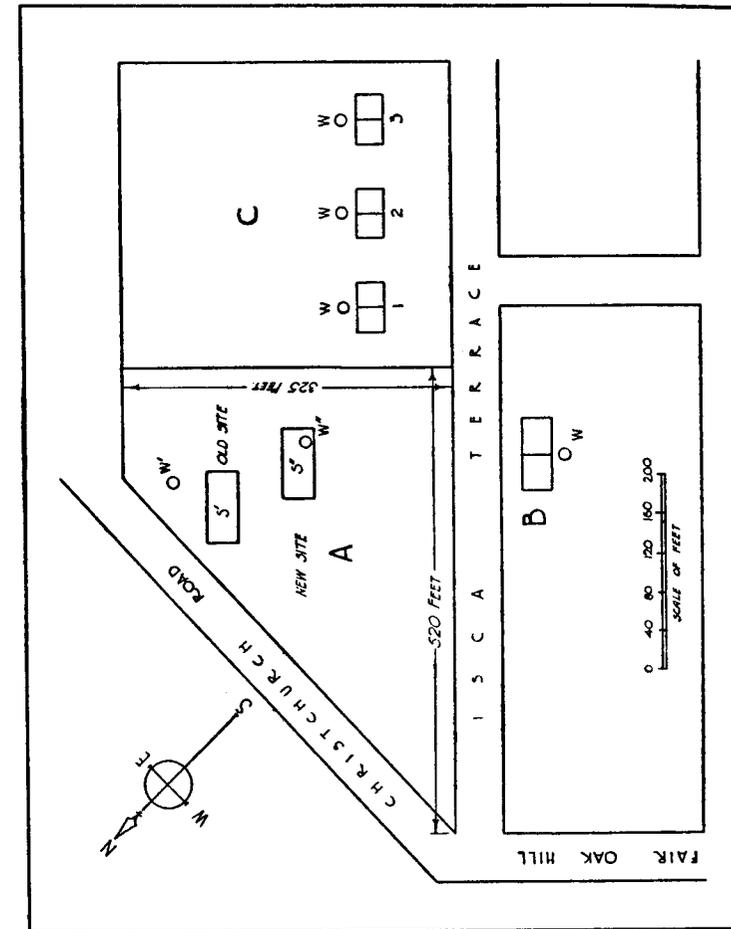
PLAN OF A SITE IN CHRISTCHURCH ROAD, NEWPORT, MONMOUTHSHIRE
